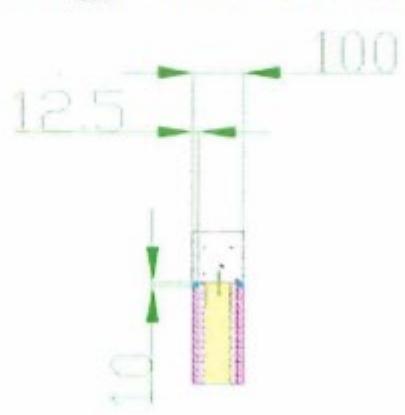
wall gypsum to stone thickness  $\geq 100$  mm
